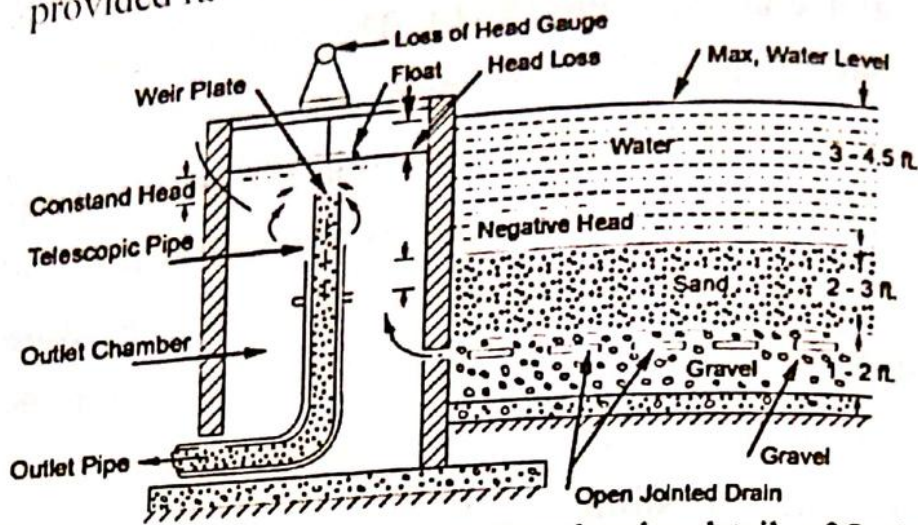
Section a-a through filter showing details of Outlet Chamber
